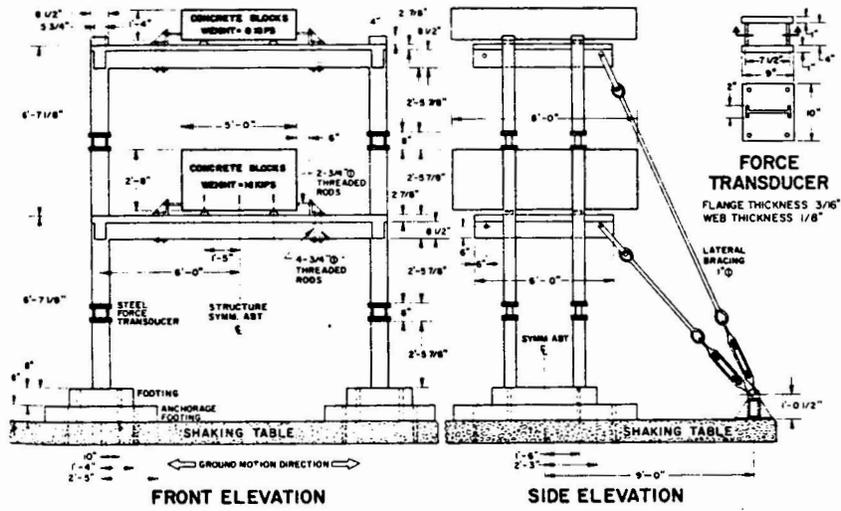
Test Structure and Test Arrangement on Shake Table (Reference 19)
